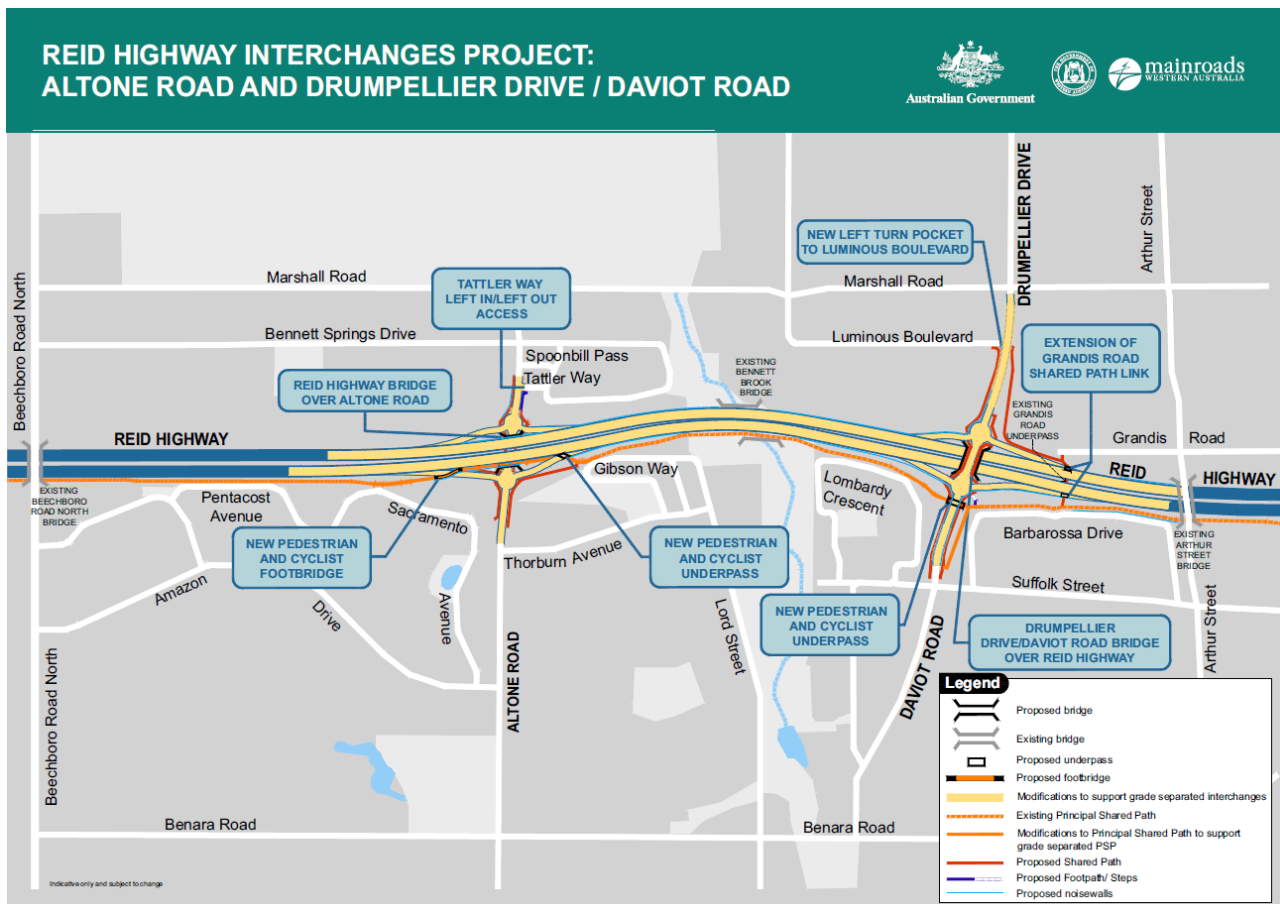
Proposed Reid Highway intersections at Altone Road and Daviot Road / Drumpellier Drive
